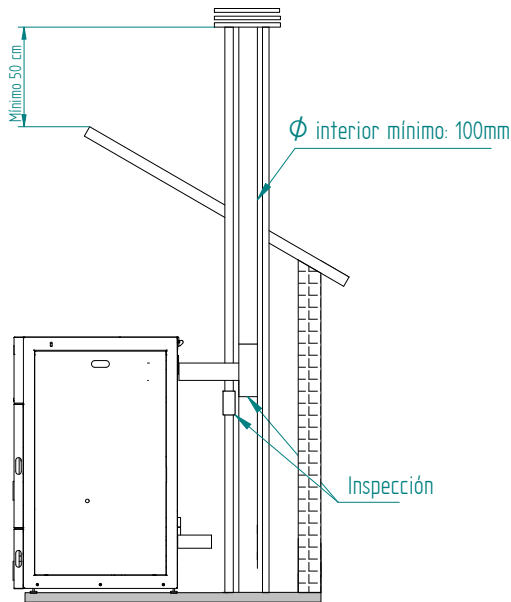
Side view of the boiler installation with a shaft, highlighting the inspection point.
